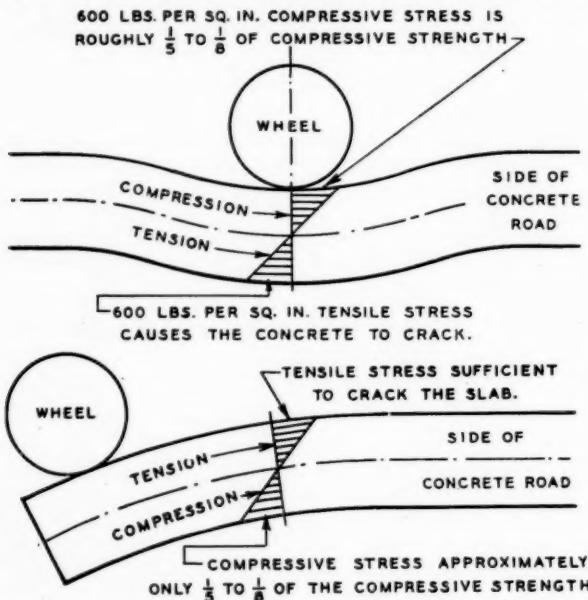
BENDING STRESSES PRODUCED IN CONCRETE ROAD SLAB.
